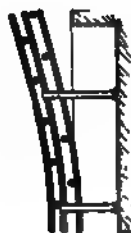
Elevation of Hot Coke Conveyor at Dumbrick Pavell.
